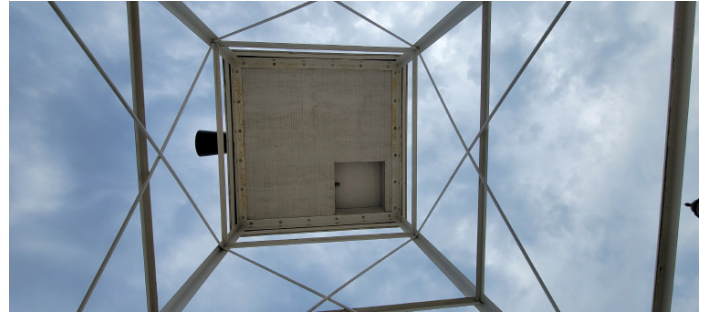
D-333 Underside of fog signal superstructure; note roof hatch in northeast corner of floor.
